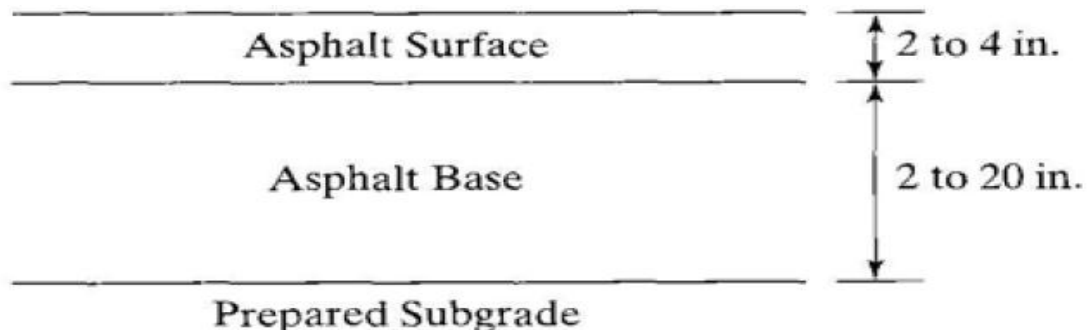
Typical Cross-section of a Full Depth Asphalt Pavement
